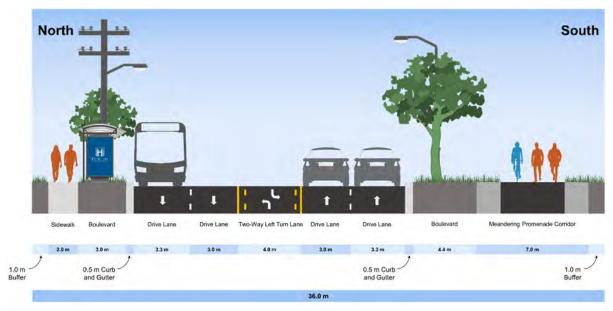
Barton Street - Fruitland Road to Fifty Road Recommended Design Concept
